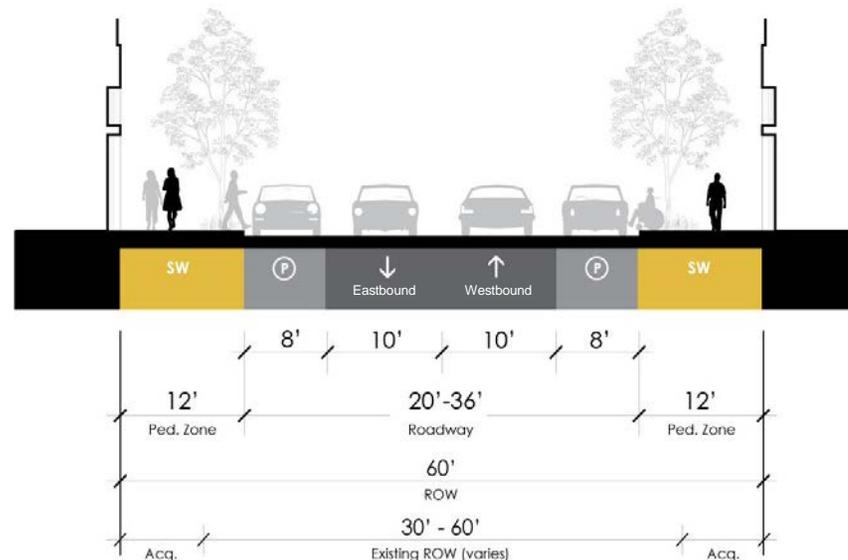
Retail Street Illustration (18th Street View Looking West to Main Street)
